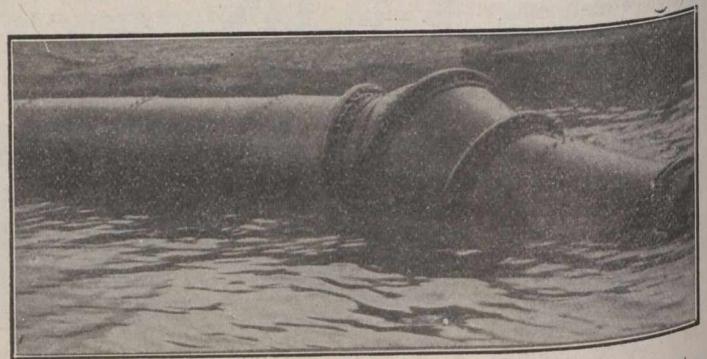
A 72-inch Flexible Joint Connected Up, and (at extreme right) An Expansion Joint.
